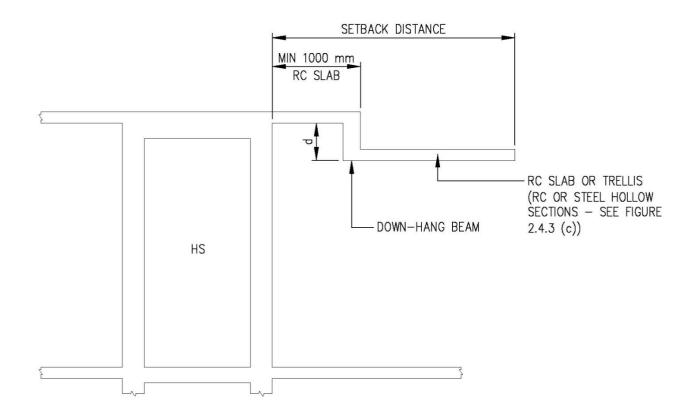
(a) REQUIREMENT ON SETBACK DISTANCE OF HS WALLS (WITH DOWN-HANG BEAM)
